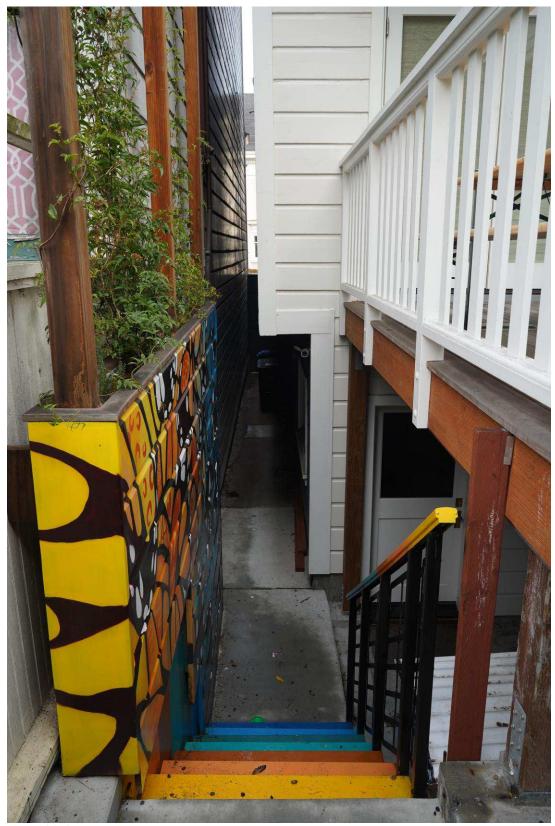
Steps from backyard to excavated basement level at southeast façade, view northwest.
